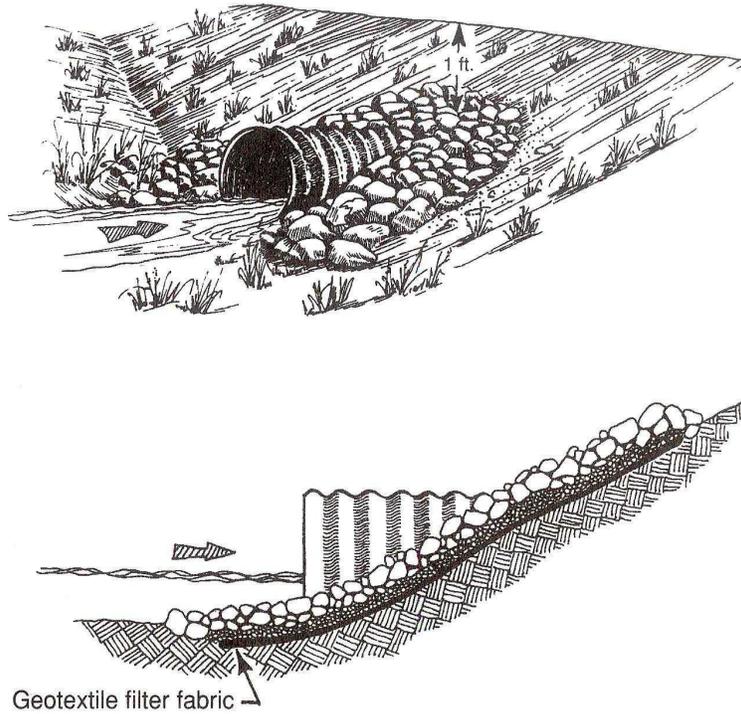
Culvert Installation Without Change in Stream Bottom Elevation.
